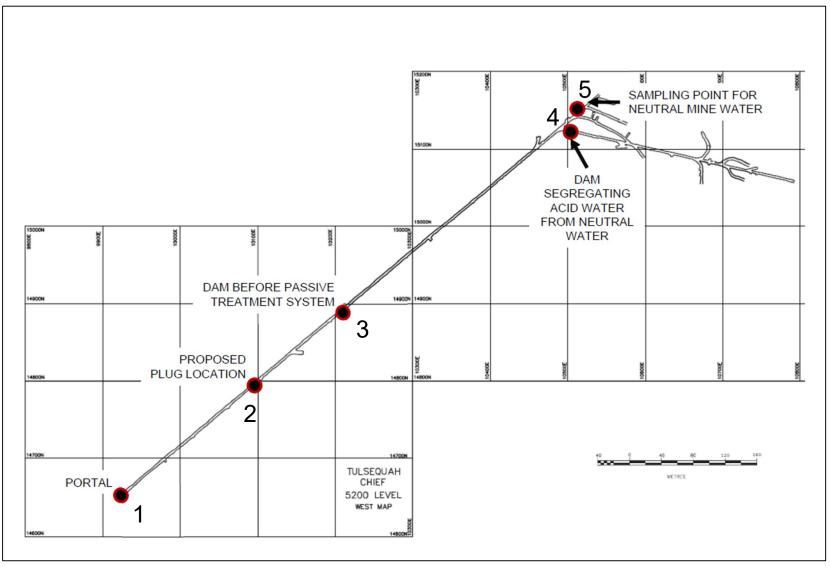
5200 Level Underground Workings with Proposed Inspection Locations
